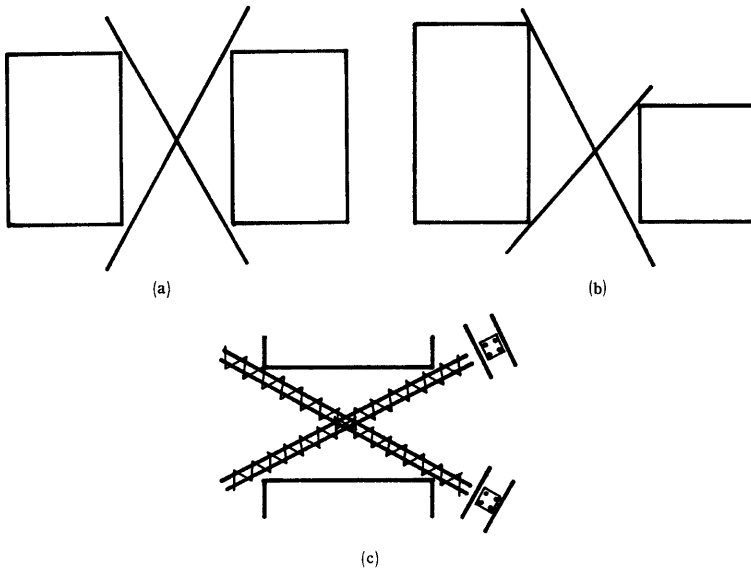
New idea for arrangement of reinforcements in walls between openings.
